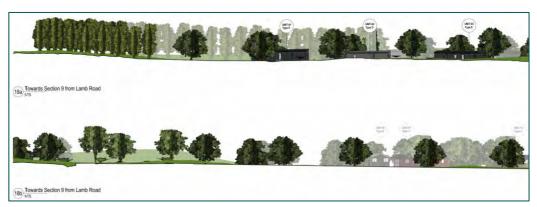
Sections Looking North Towards Section 9 From Lamb Road (top image showing dwellings proposed adjacent to Lamb Road).
